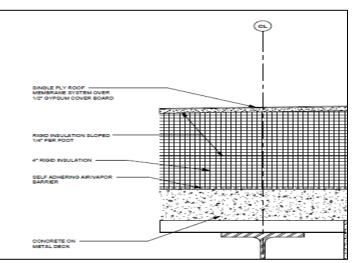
Sectional view of the roofing. Image Courtesy of BCJ
